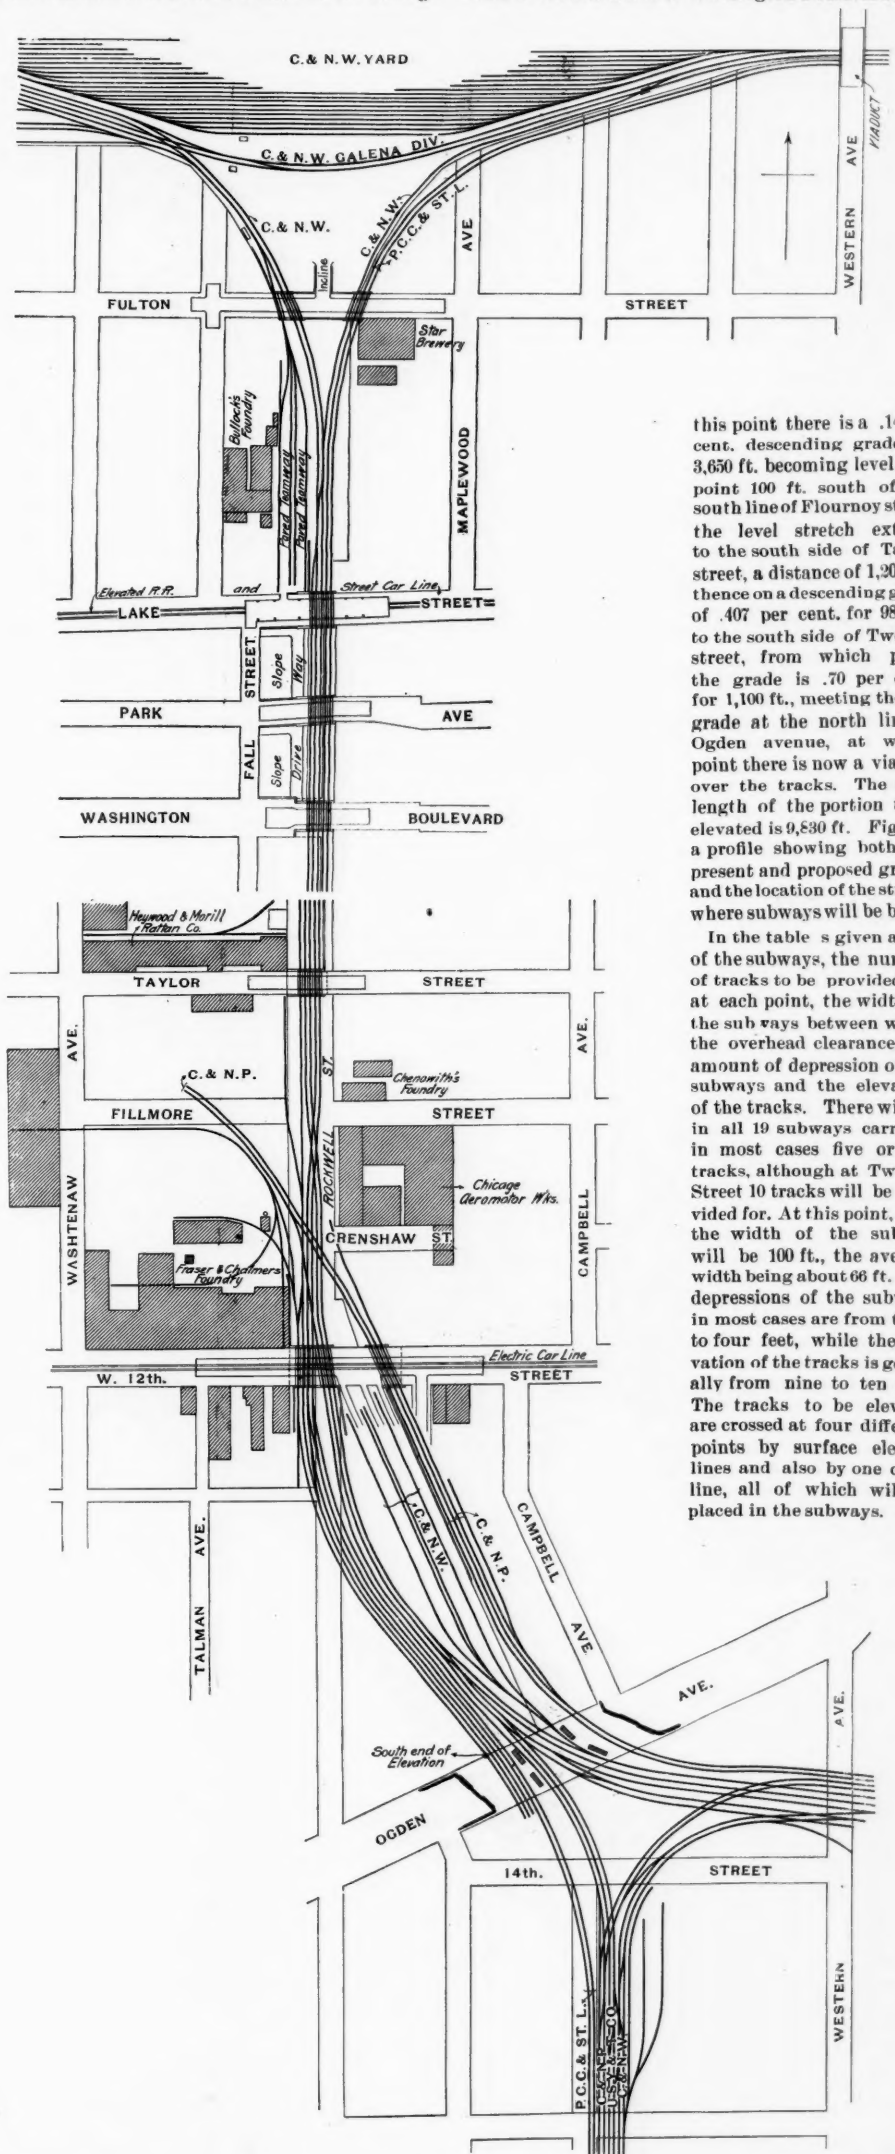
Chicago Track Elevation—Arrangement of Tracks at Either End of Portion to be Elevated.
